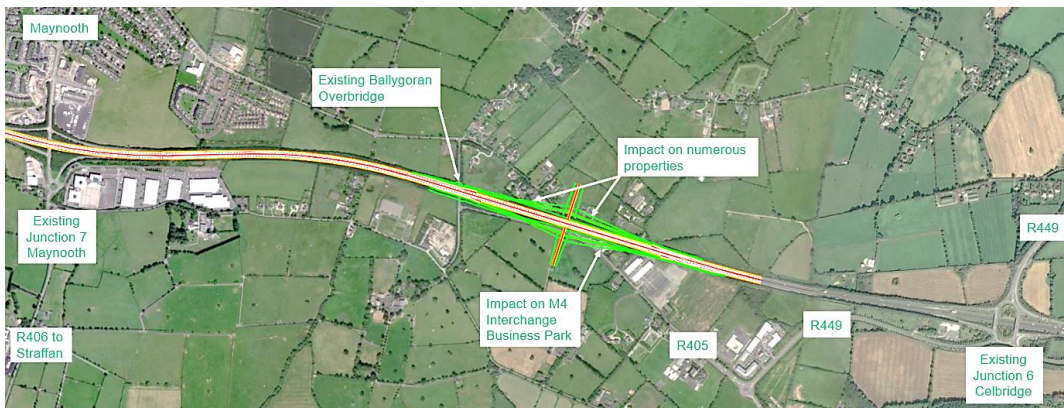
Location F - Junction East of Existing Ballygoran Overbridge
